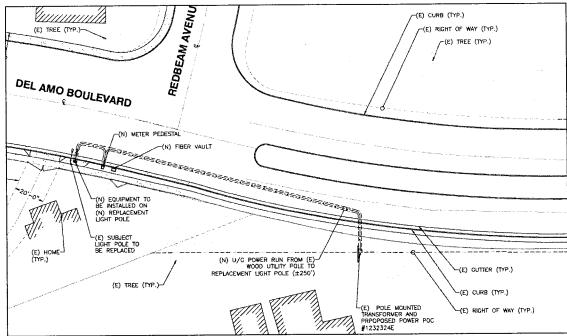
Underground electrical connections for the Applicant (Source: Plans page A-1, panel 1).
